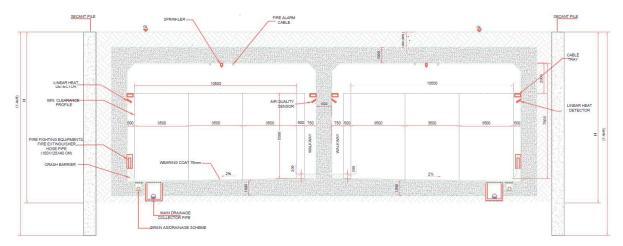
Typical cross section with ventilation system and fire-fighting equipment's
